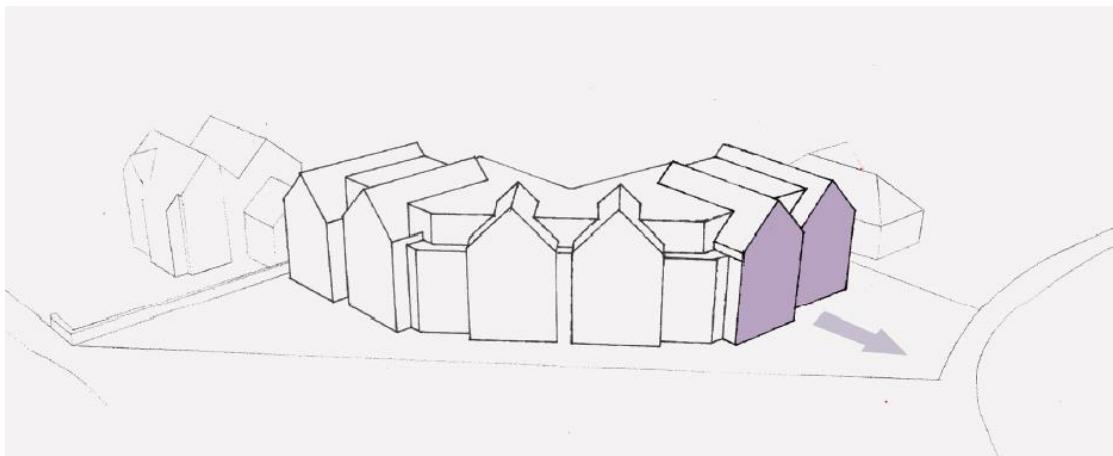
Proposed massing plan (area colour in purple facing Crofton Lane)
